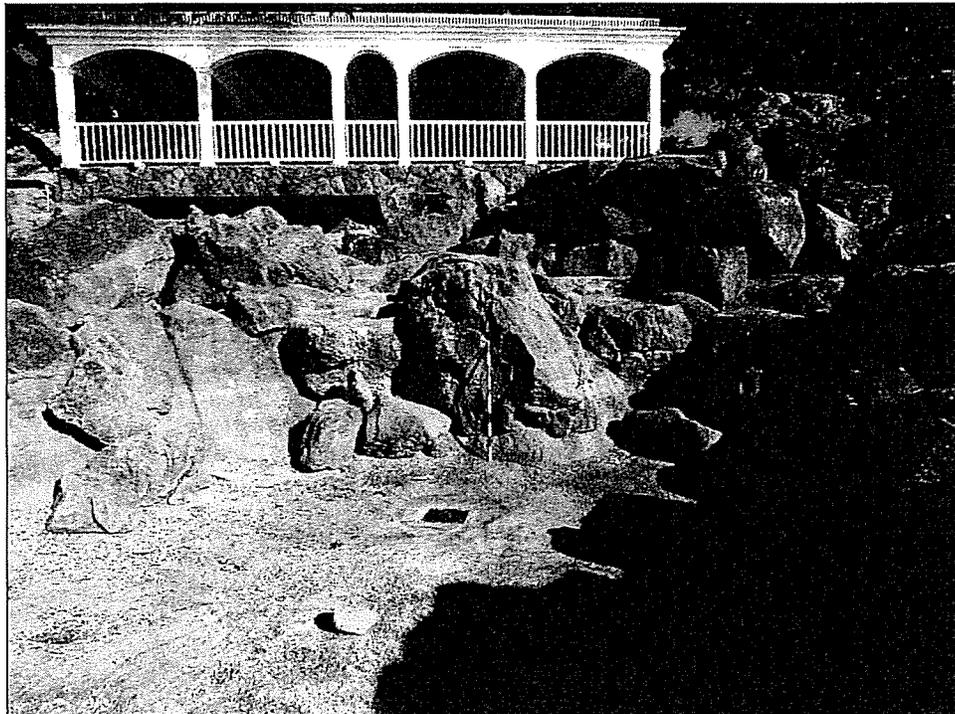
Pavilion above drained water feature with large boulders, view to southeast (CSH photo)
